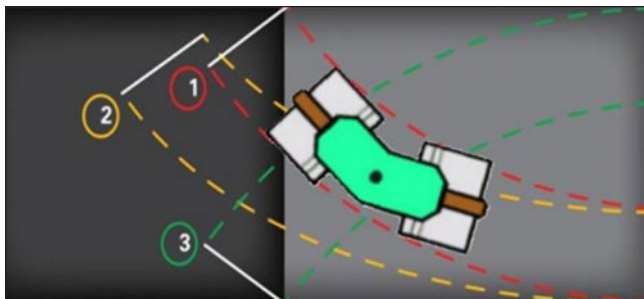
Rolling the joint at an angle to the paver's direction of travel [1, 6]
